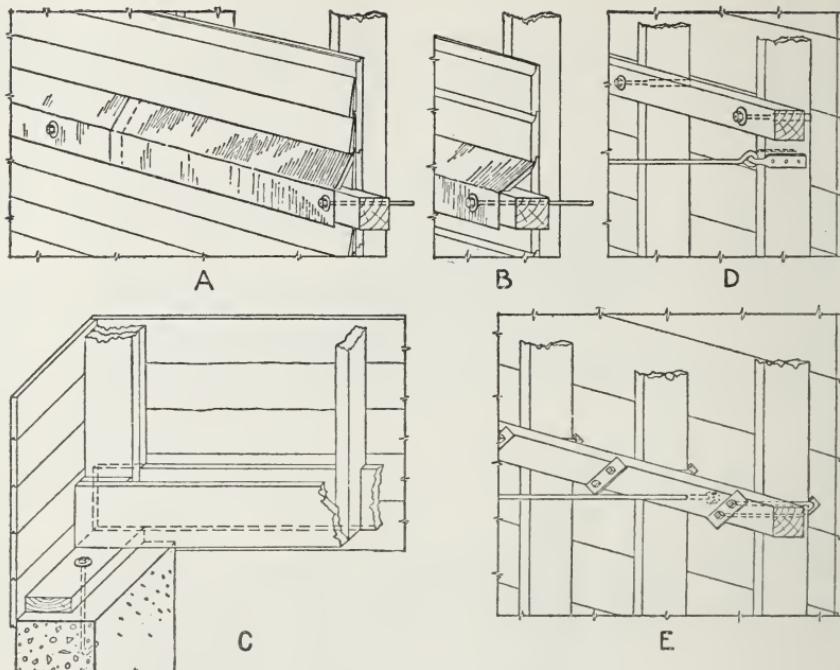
Methods of reinforcing wall for greater depth of wheat than shown in table 3, and bin wall details: *A*, Exterior stay timber with flashing on double-boarded wall; *B*, flashing with single boarding; *C*, framing of studs, joists, and sill at corner of a granary; *D*, stay timber secured with wagon box bolts, the tie rods being secured to studs; *E*, inside stay timber secured to studs with U-bolts, the tie rods extending through the timber.
